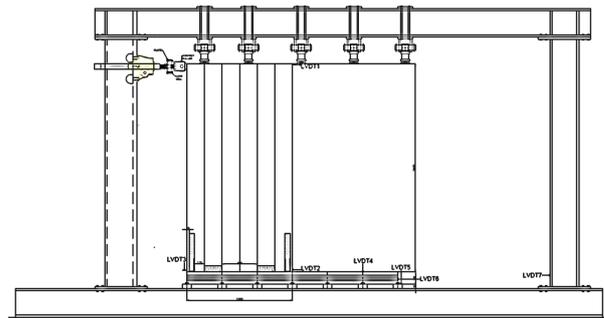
Racking test layout of 2.4 m x 1.2 m CLT panel
